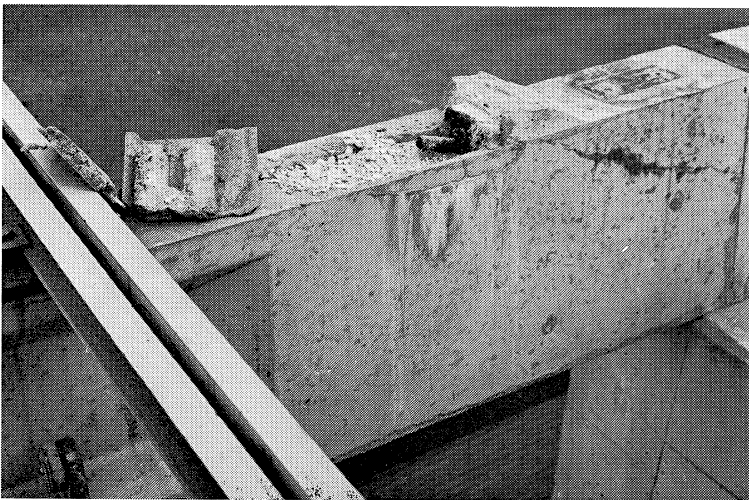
As a result of shrinkage, climatic effects, etc. the encasing concrete over the recessed tendon anchorage has become detached, permitting ingress of water. The nib on the right was cast monolithically with the beam and has not become detached.
